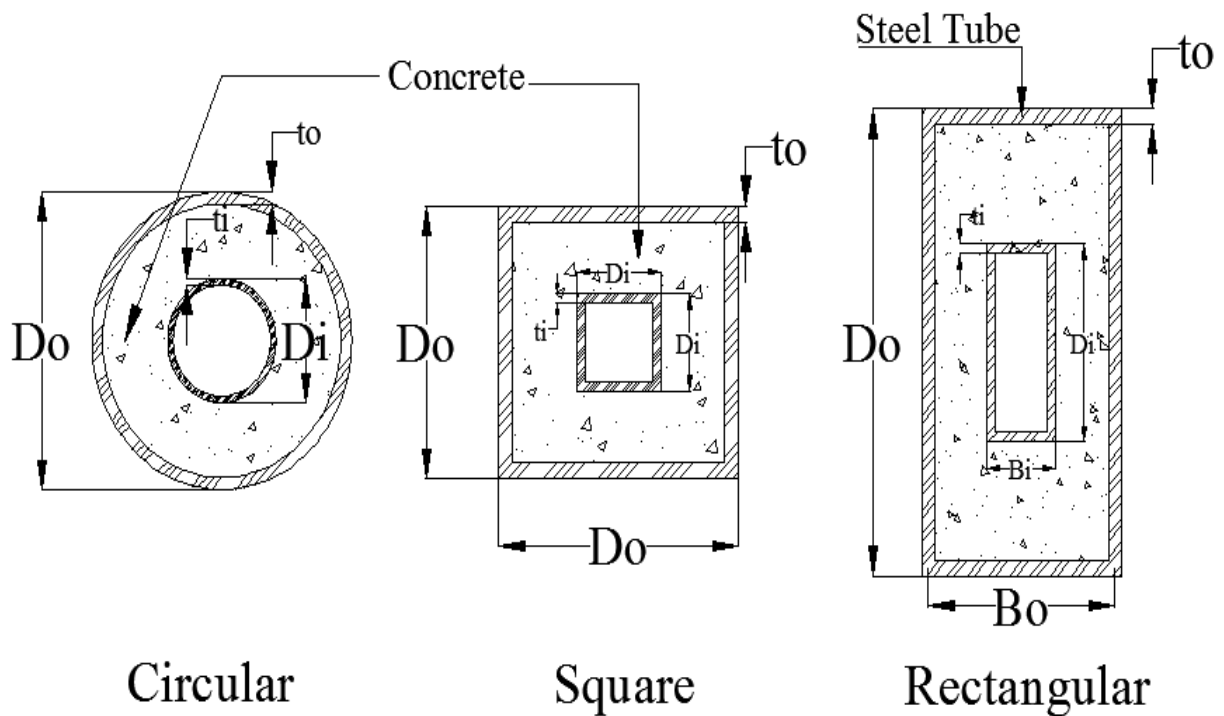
Concrete filled double steel tubular (CFDST) core configuration
